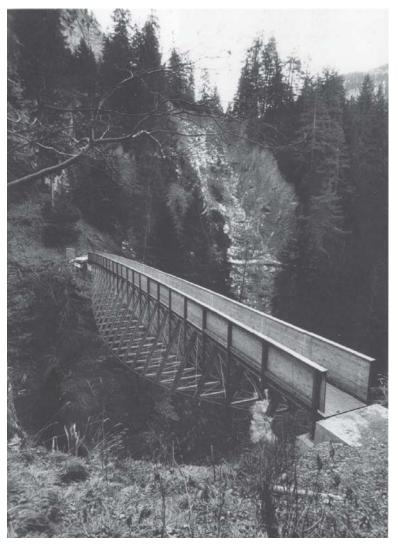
Traversiner steg 1 (Baus and Schlaich (2007))
